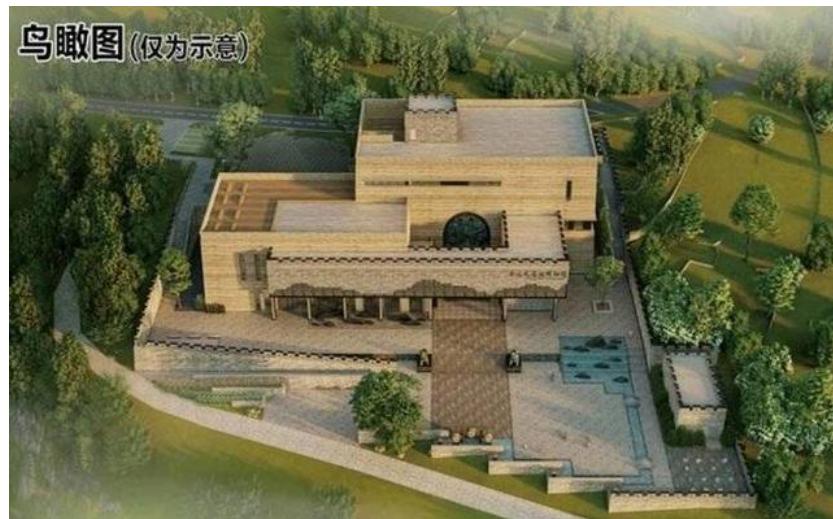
Qi Great Wall Museum planning effect. Source: Qilu Evening News
